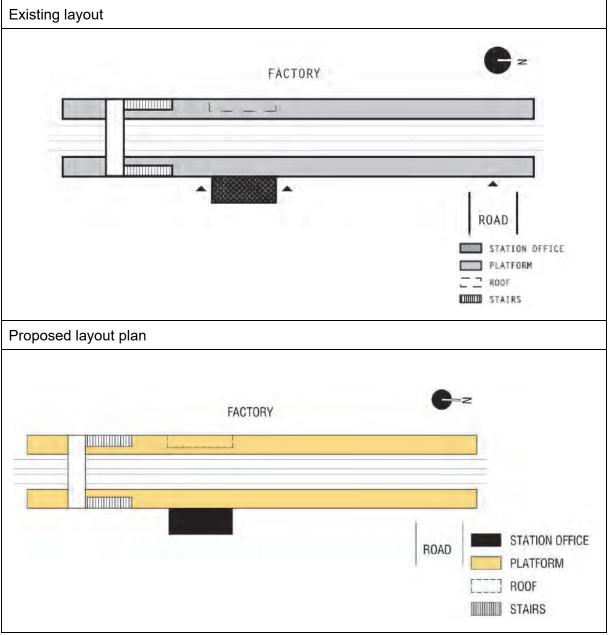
Existing and Proposed Layout Plan (AungSunMyo Station)
